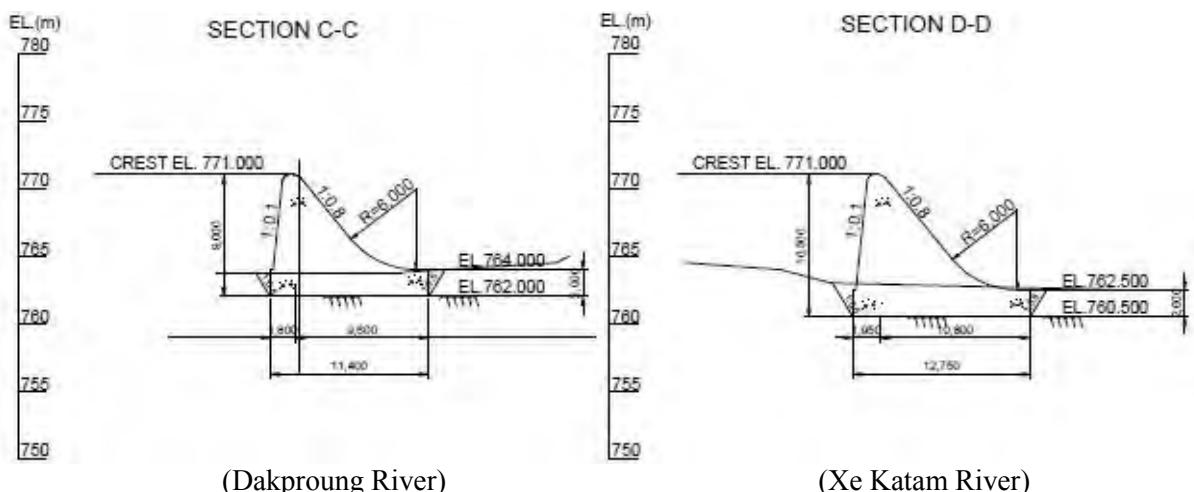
Typical Cross Sections of Intake Weirs
